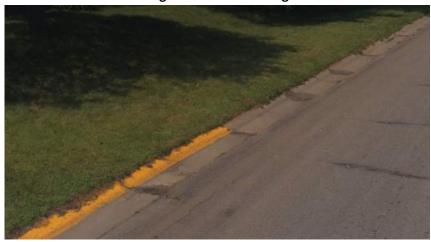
Typical Section from Main Street W to 5th Avenue NW/SW
